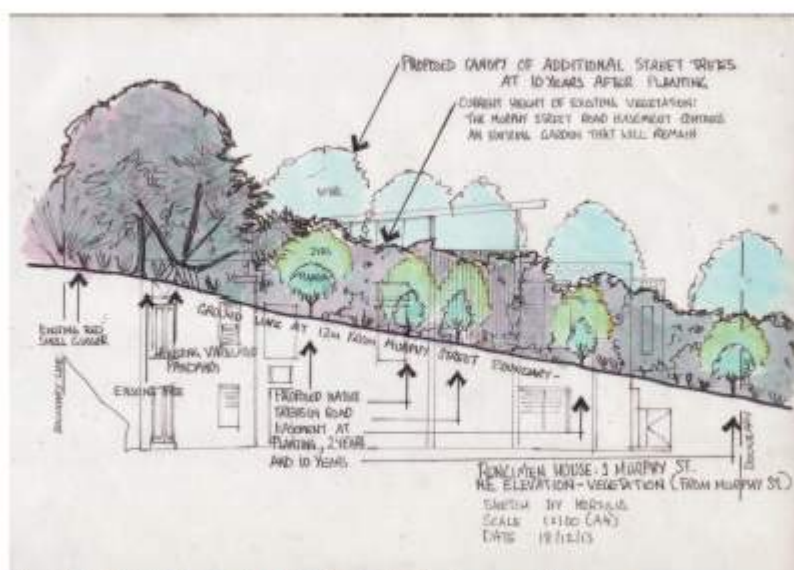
North East Vegetation Elevation at planting, 2 years and 10 years.
